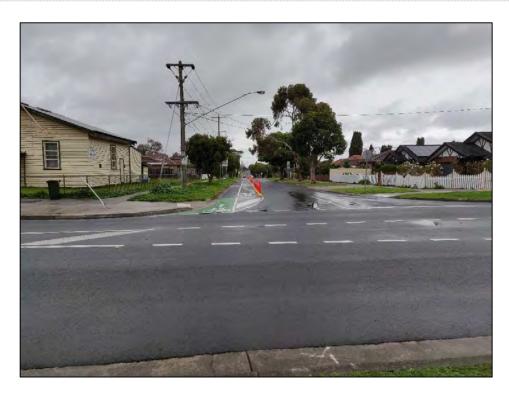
On Pascoe Street looking towards Northumberland Road, looking south
